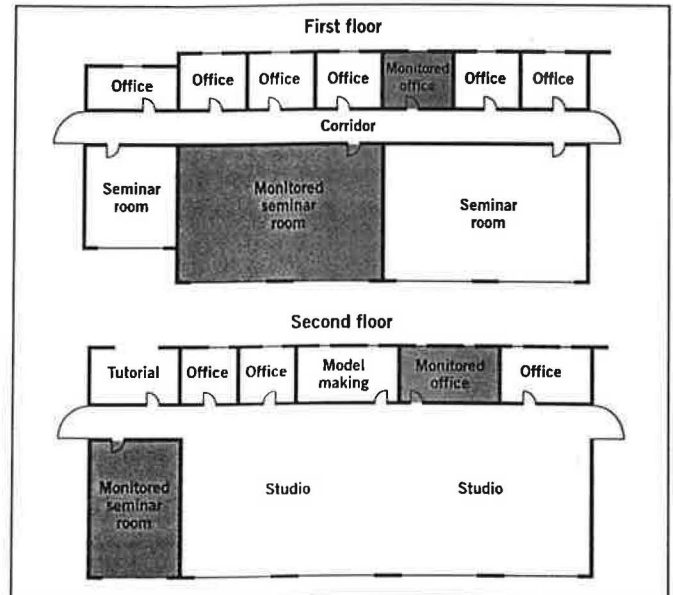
First and second floor plan highlighting the monitored seminar rooms and offices. The Portland Building has several towers to aid natural ventilation.
